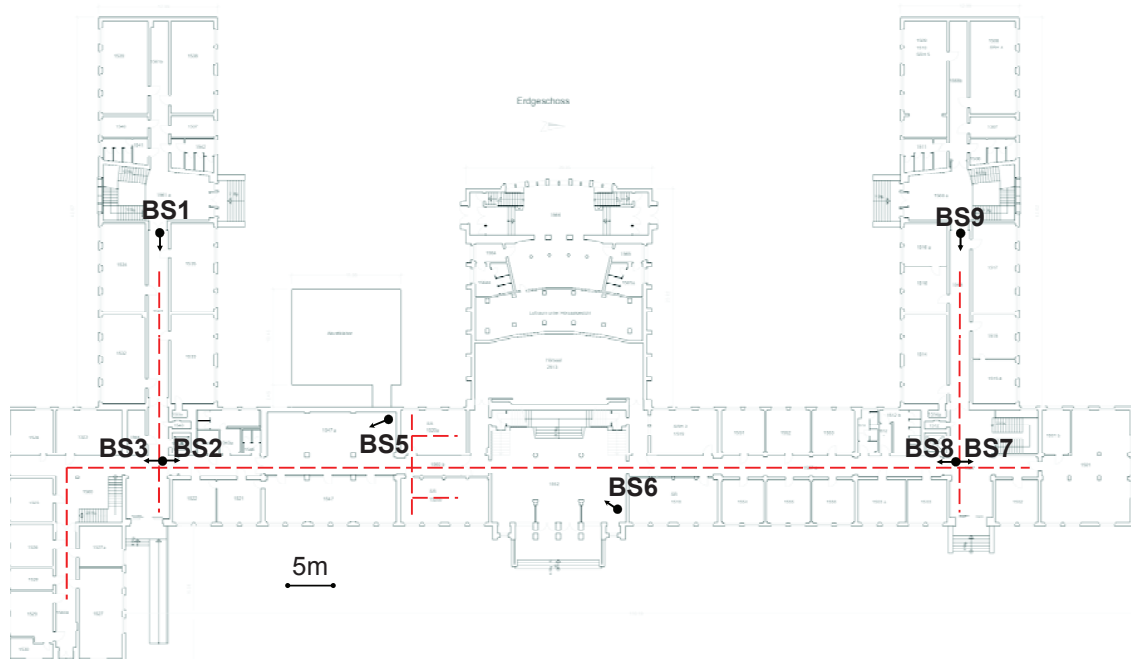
Measurement routes in the floor plan of the Helmholtzbau
